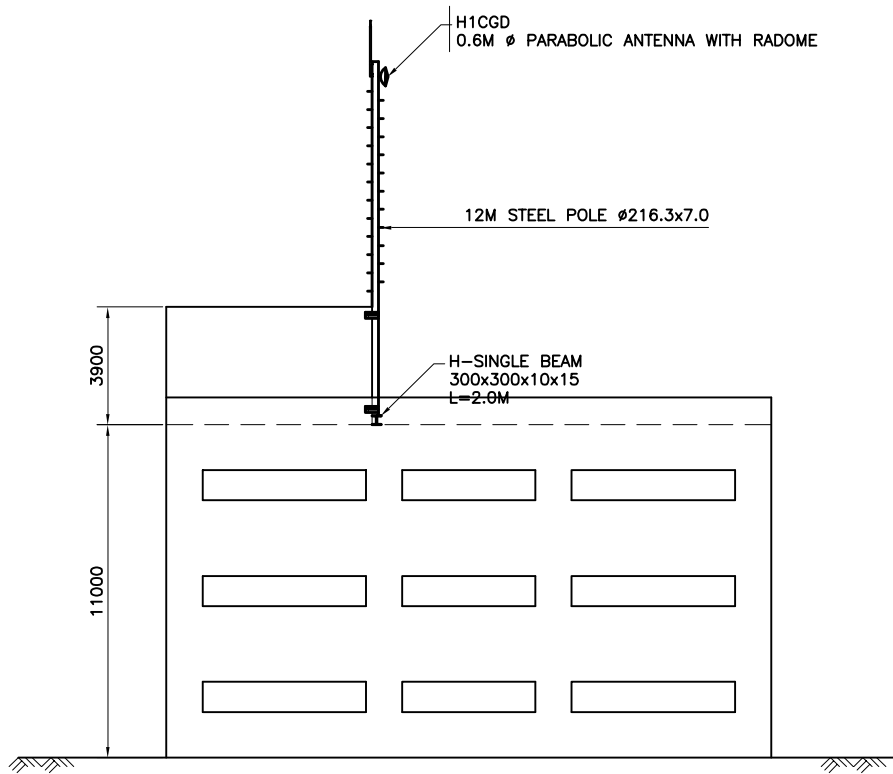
EQUIPMENT LAYOUT PLAN FOR RECEIVING STATION
